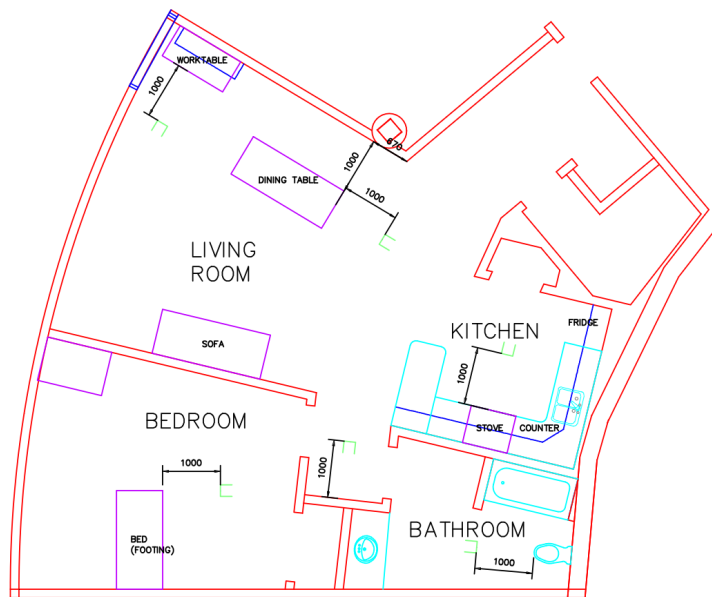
Floor plan of the ILS. Positions where the participant stood 1 meter from appliances or furniture are marked in the green "open" box on the floorplan.
